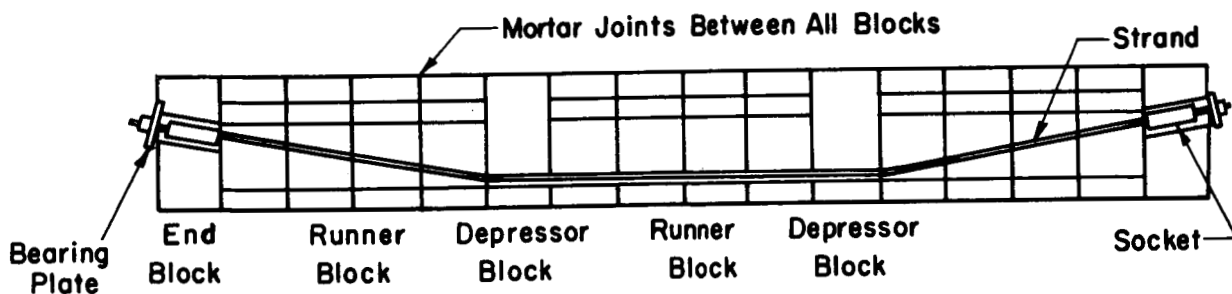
TYPICAL PRESTRESSED CONCRETE BLOCK CONSTRUCTION
